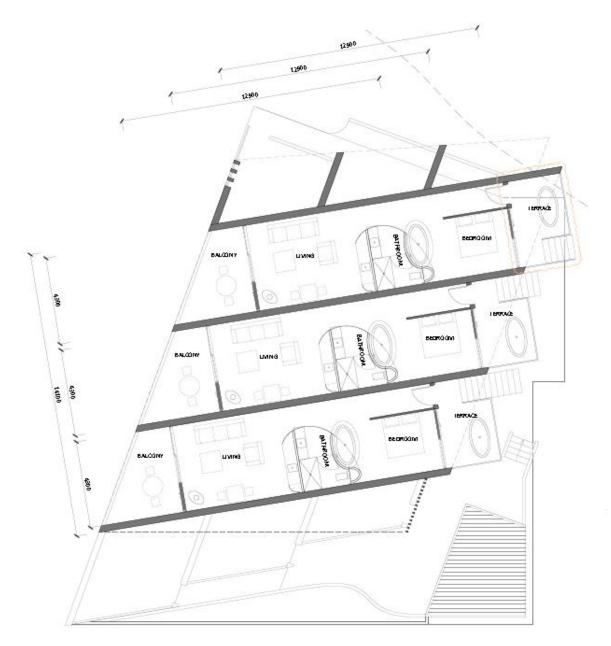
Extract of Building 2 (eastern-most) basement carpark and ground floor plan
